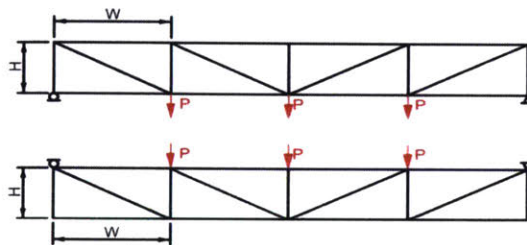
Standard Rectangular Truss design for bridge (top) and roof (bottom) typologies
